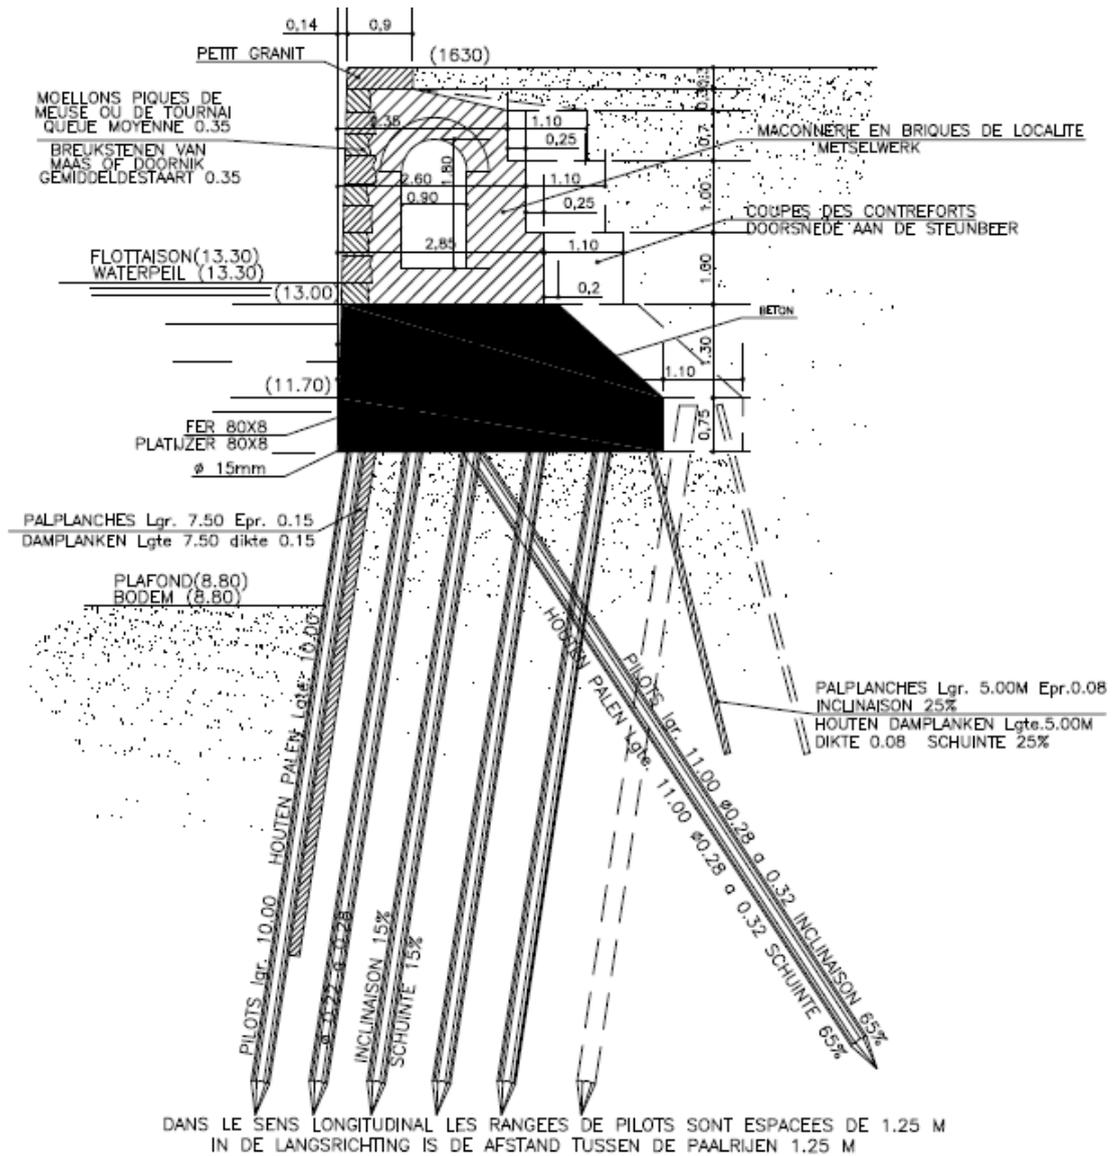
Cross section existing quay wall Vergote Dock (source : Port of Brussels)
